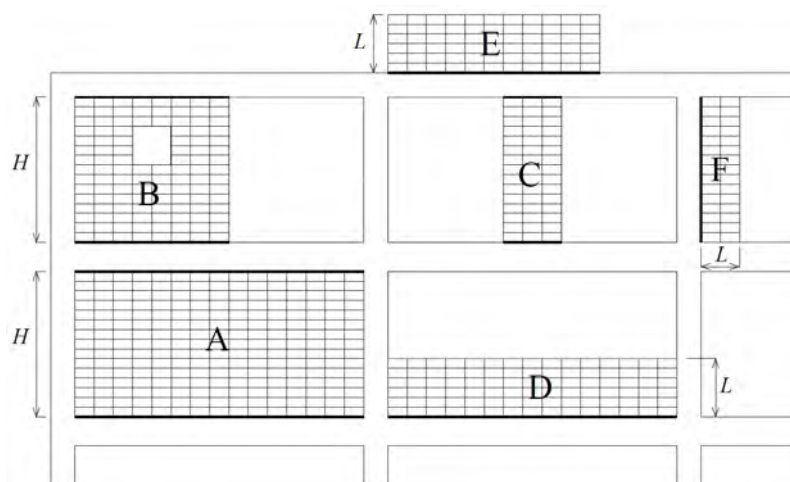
General nonbearing walls (A,B,C) and cantivever nonbearing walls (D,E,F)
